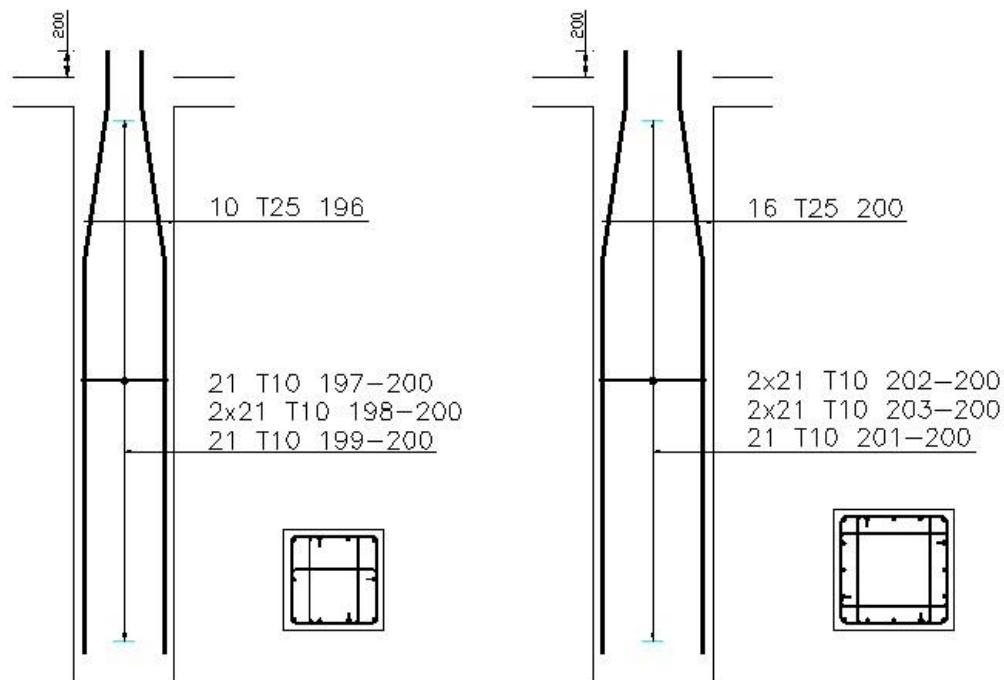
2 Typical Rectangular Column Elevations and Sections
